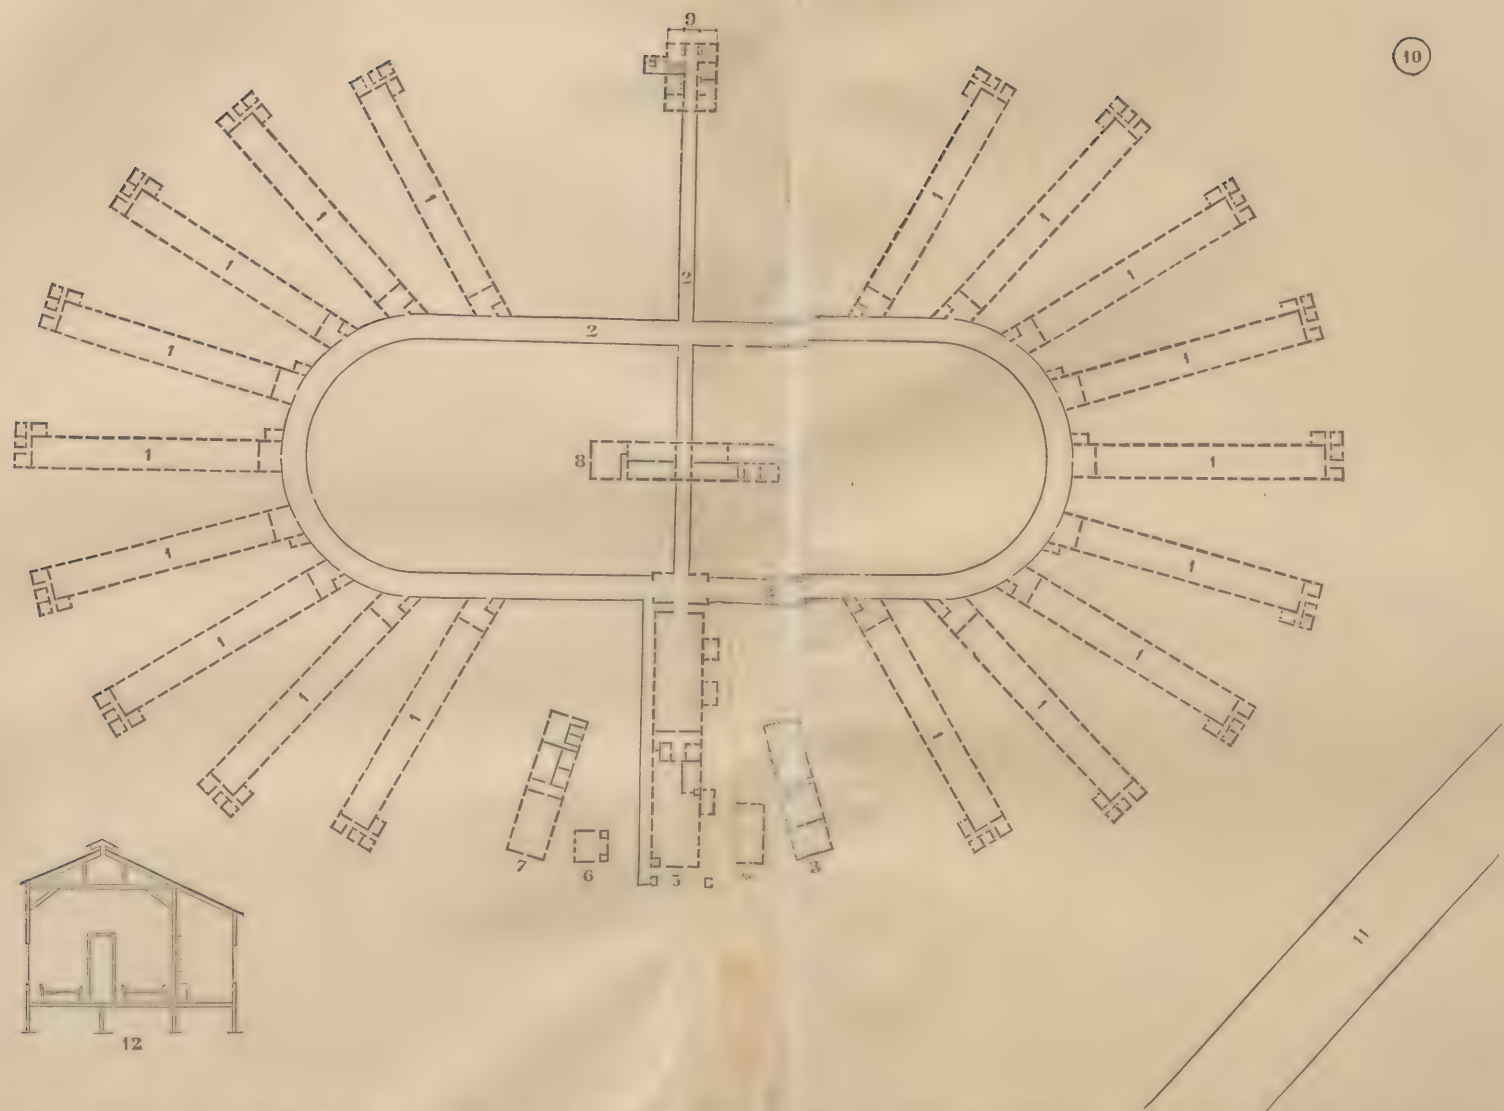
GROUND PLAN OF MCCLELLAN HOSPITAL, PHILADELPHIA, PA. Scale, 195 feet to the inch. 1 1 1 Wards. 2 2 Corridors. 3. Quartermaster's building. 4. Engine-house. 5. Kitchen building. 6. Stable. 7. Commissary building. 8. Administration building. 9. Officers' quarters. 10. Cess-pool. 11. Germantown avenue. 12 Section through end of ward.
